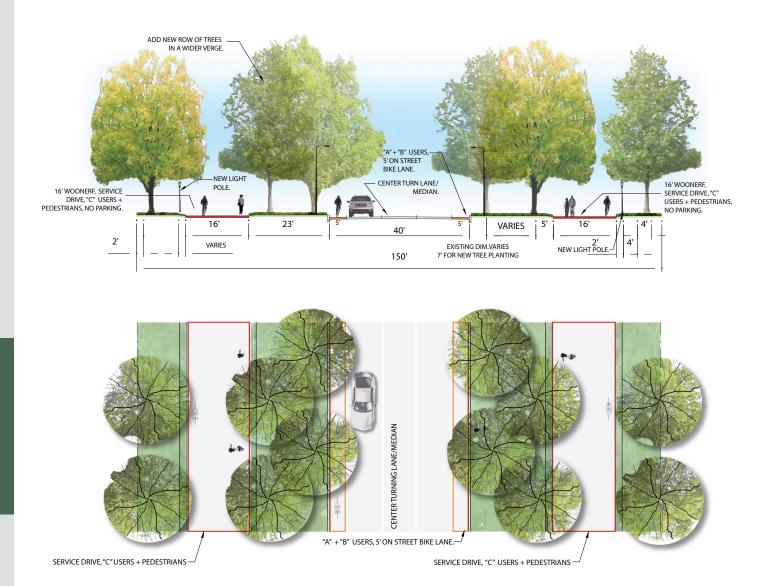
16: Southern Parkway: Zone 1, 4 & 5 Prototypical Section & Plan
